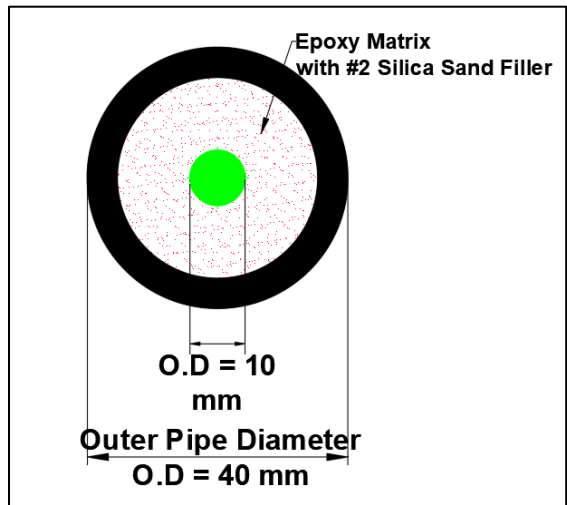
ASTM D7205 Tensile Test Specimen Cross-Section
